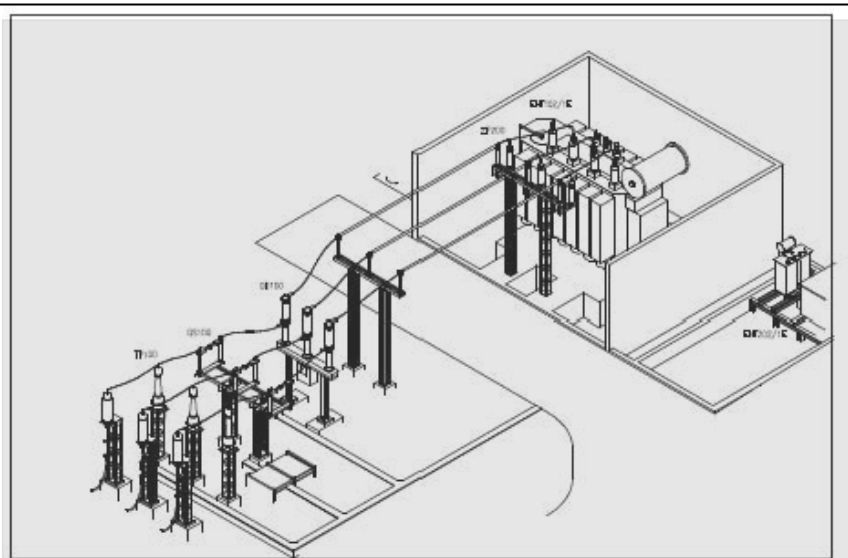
Layout of CERN's standard 66/18 kV substation
